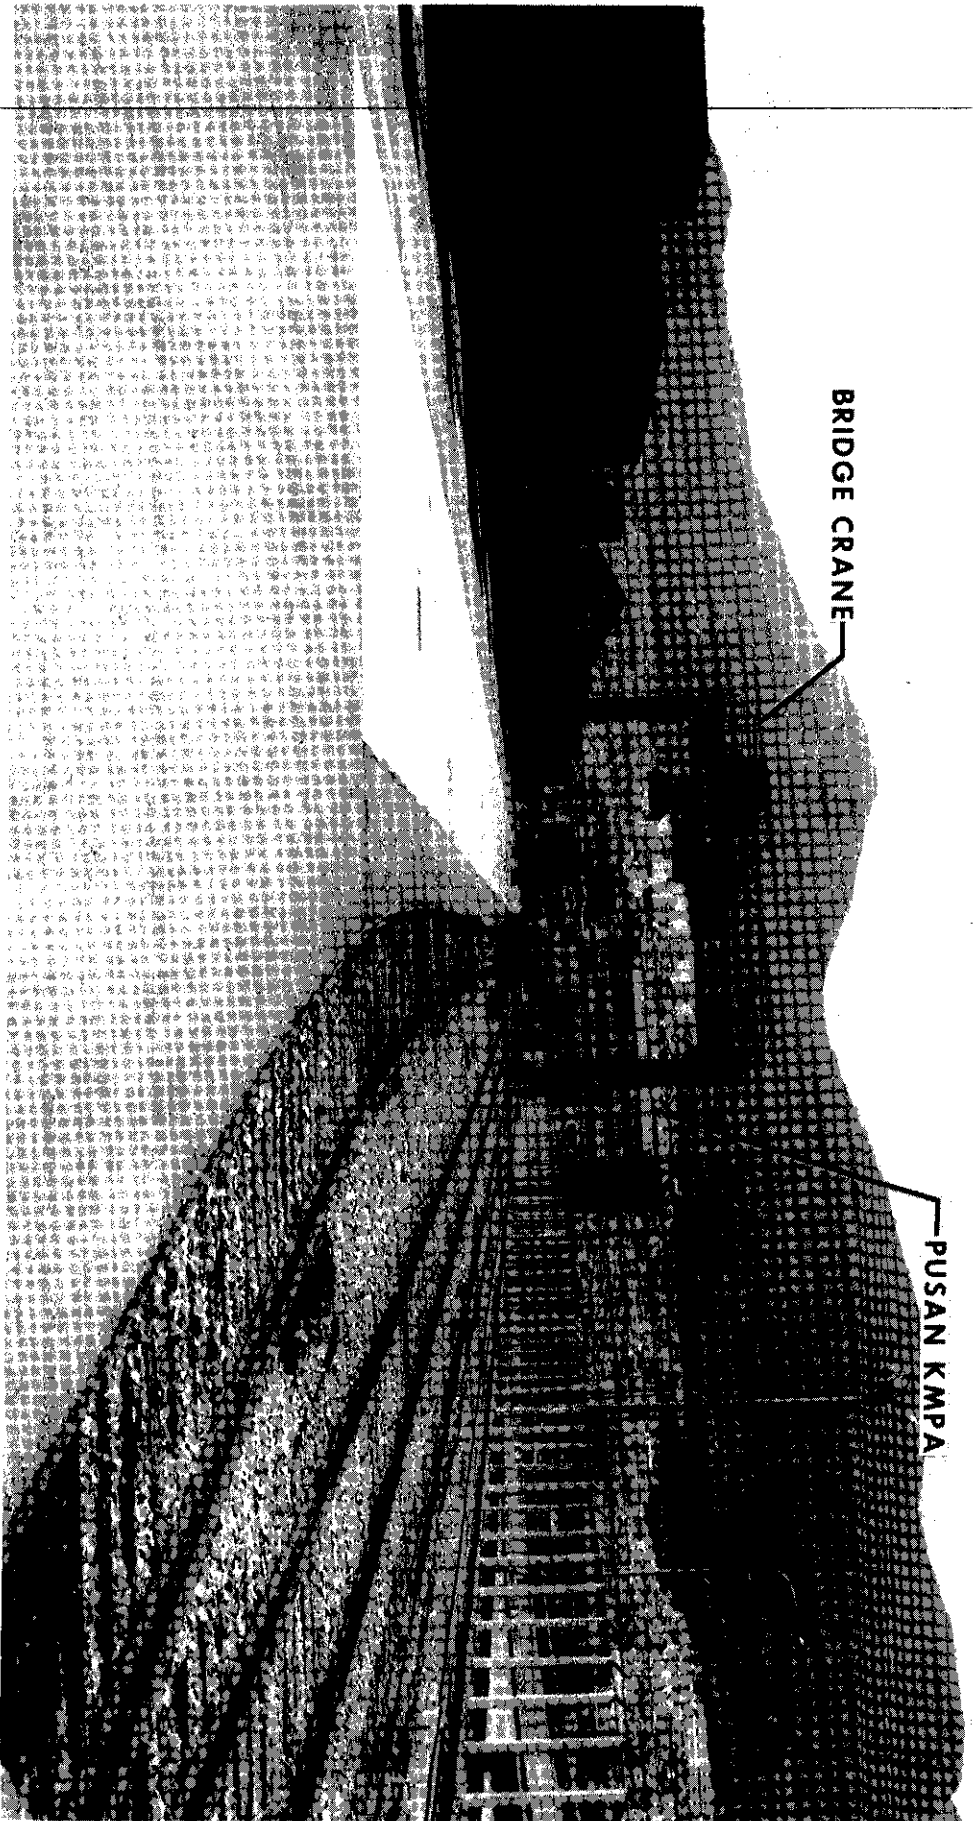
Piers 5 and 6 bridge crane transfer area (westward view).
